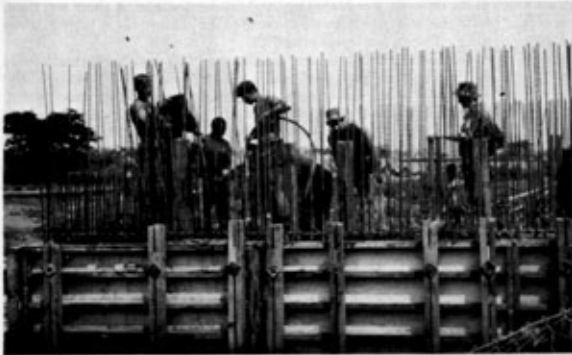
Pouring Lift 3 on the east abutment, galvanised hand buckets were used to place Lifts 1 to 5
